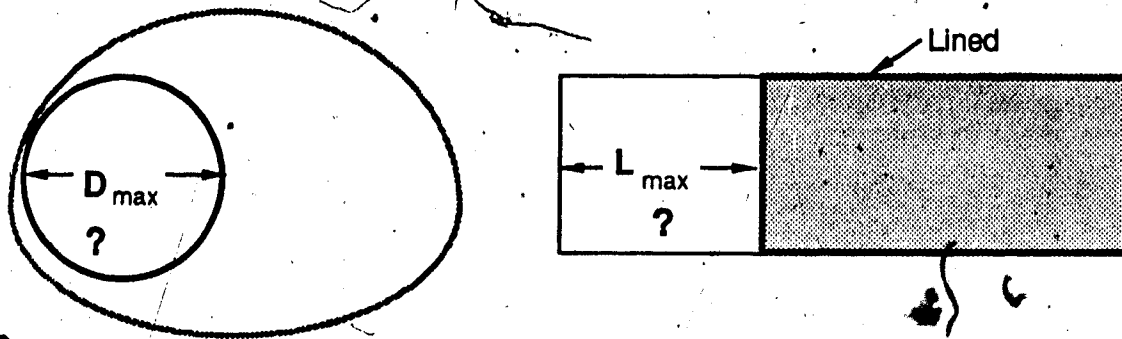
Possible problems to be faced when planning a large cross section tunnel
